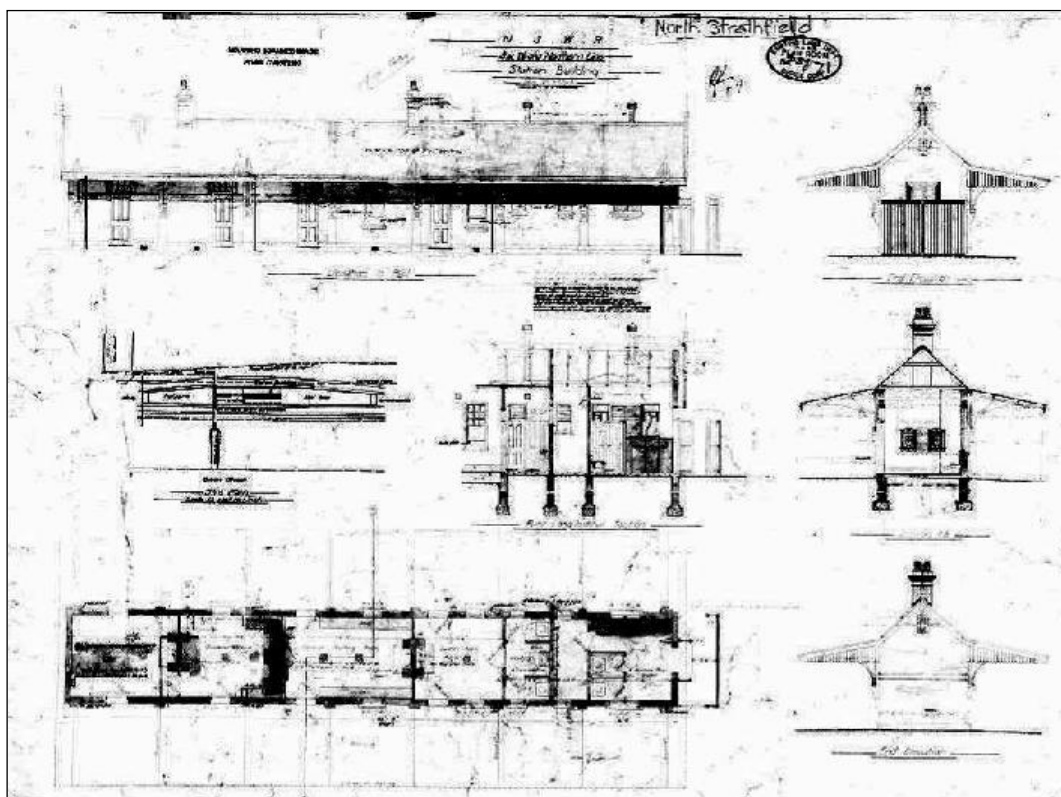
Plan for North Strathfield Station, 1917. (RailCorp Plan, Ref: 0363207)
